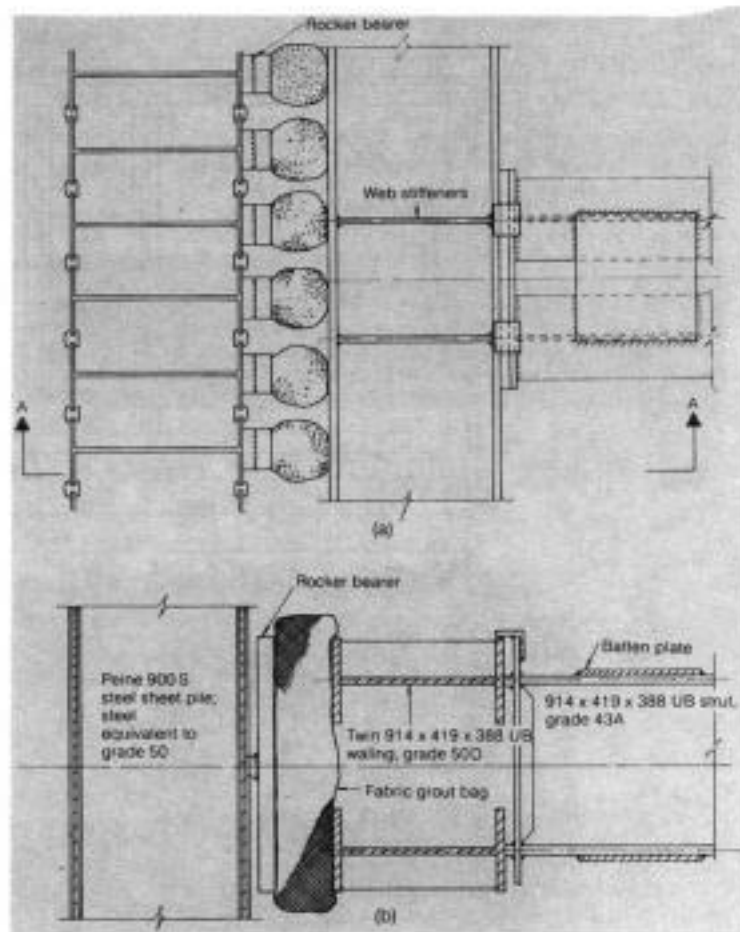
Thames Barrier: pier 4 cofferdam, details of rocker bearing: (a) plan; (b) vertical section (Grice and Hepplewhite⁹)
